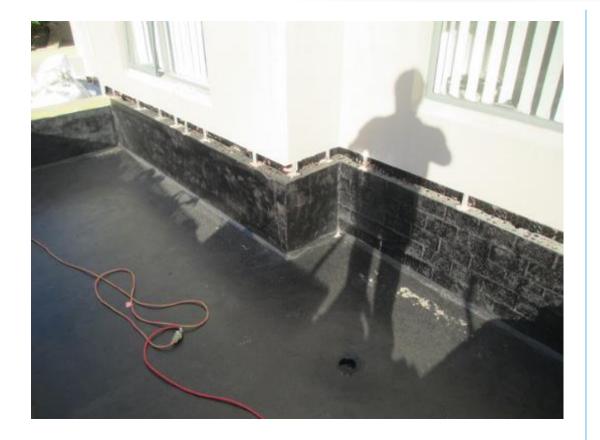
DETAIL OF MEMBRANE TERMINATION AT WALL OPENINGS WHERE THE INTERNAL AND EXTERNAL FINISHED FLOOR LEVELS DO NOT ALLOW THE UPTURN REQUIRED IN TABLE 2.1
